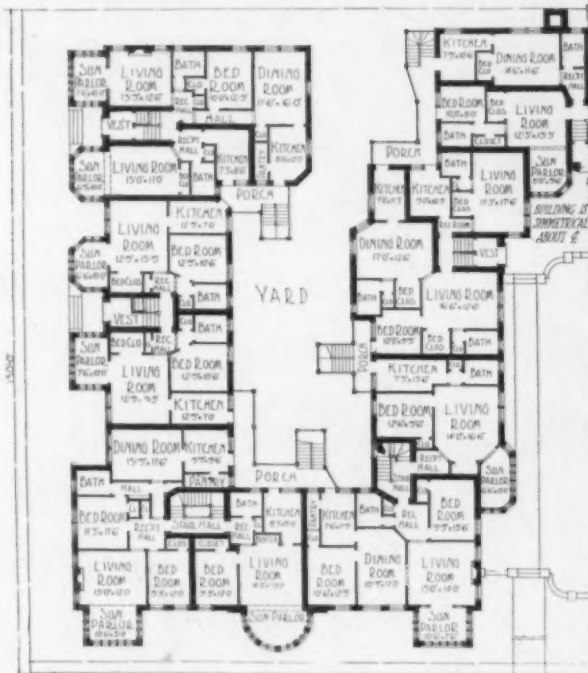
Half Typical Floor Plan and Diagram of Complete Building Showing Development of Deep Lot. Chicago Apartments. Edward Benson, Architect
